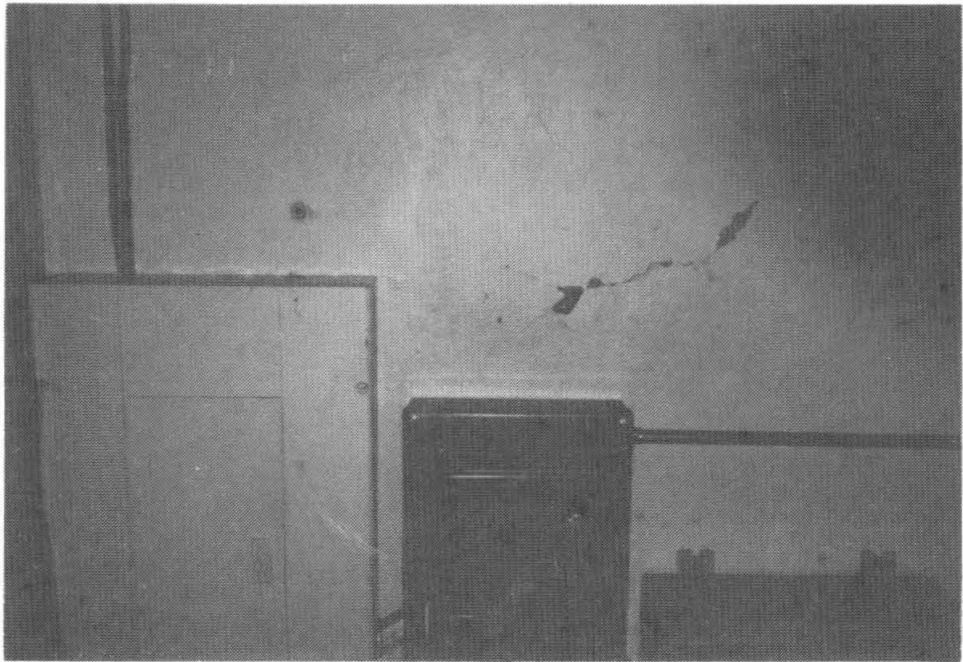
Diagonal Cracking in Central E-W Interior Wall, First Story
